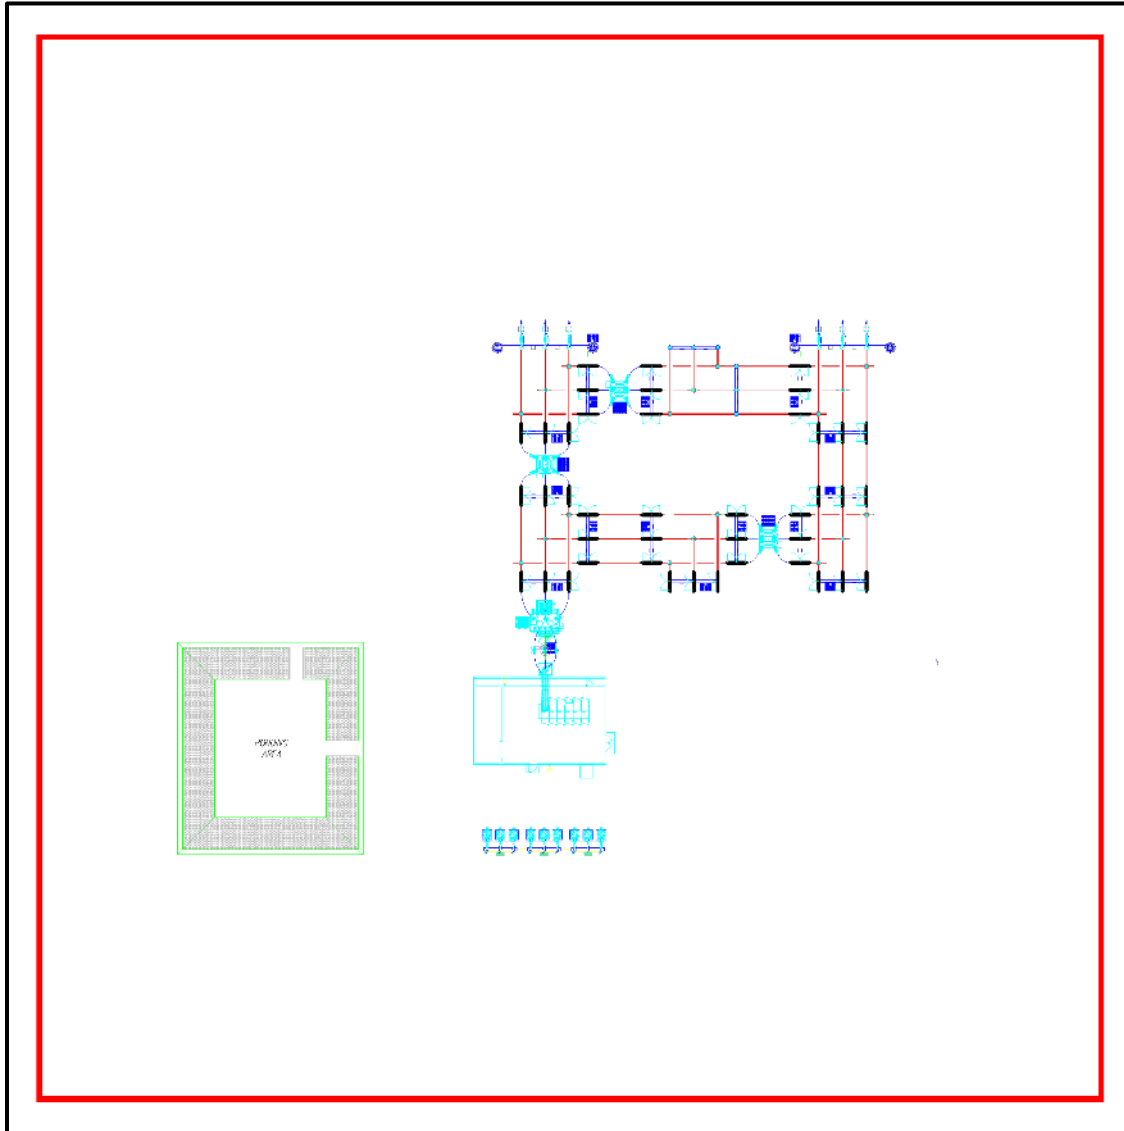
Conceptual substation site plan (layout will be dependent on final engineering and design).
